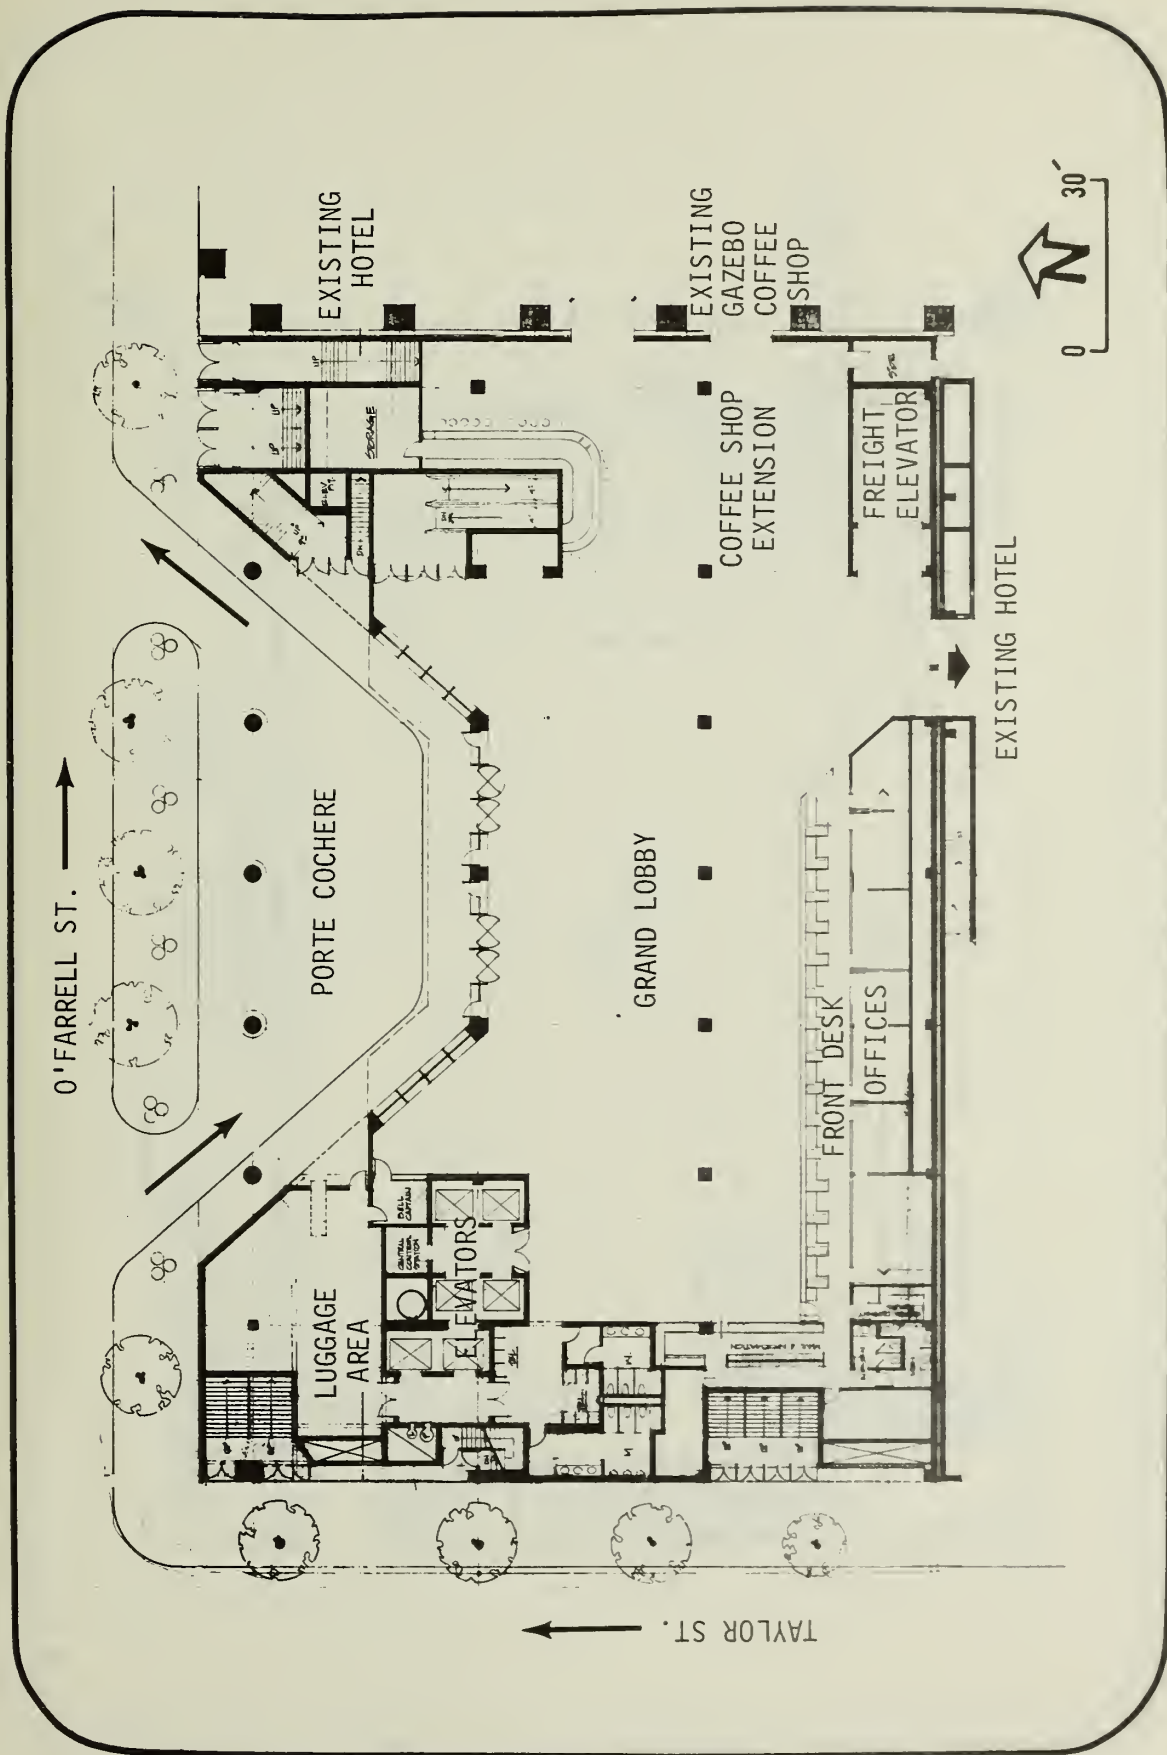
PROJECT GROUND-FLOOR PLAN
